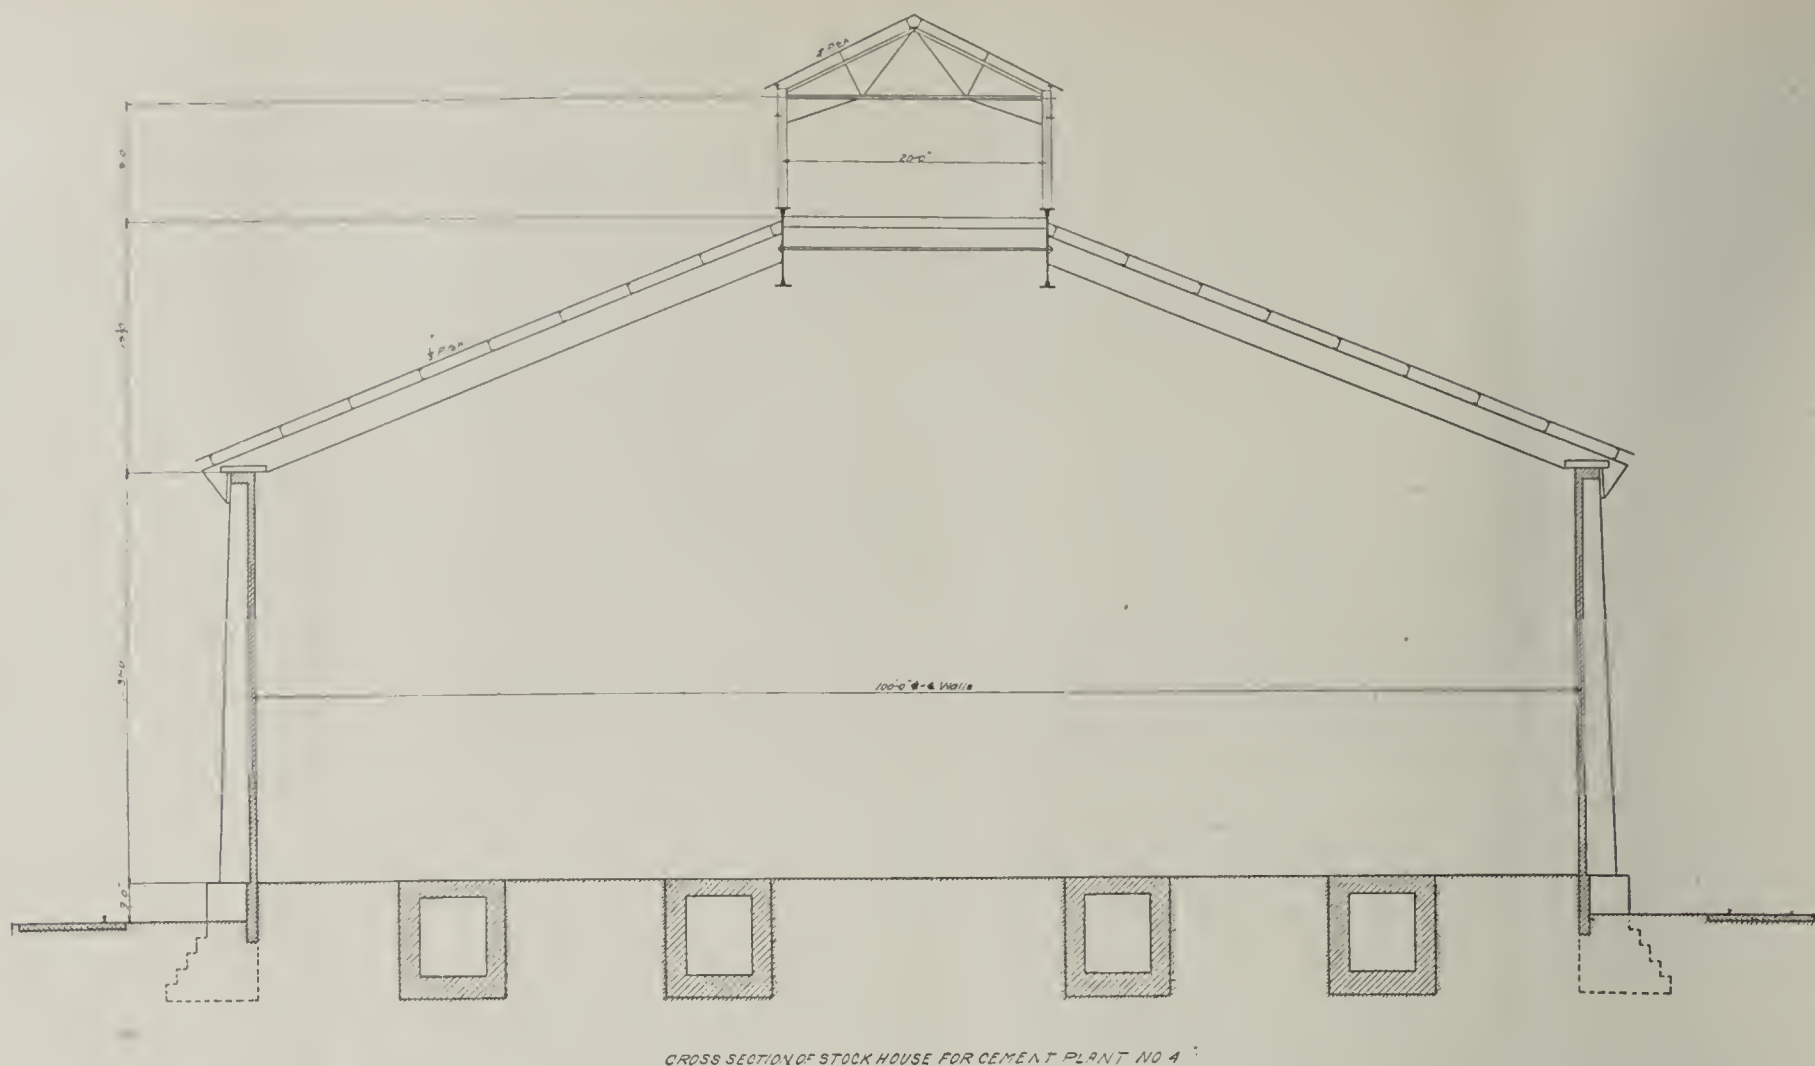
Plant No. 4. Reinforced Concrete Side Walls and Monitor Floor Supported on Longitudinal Girders.
